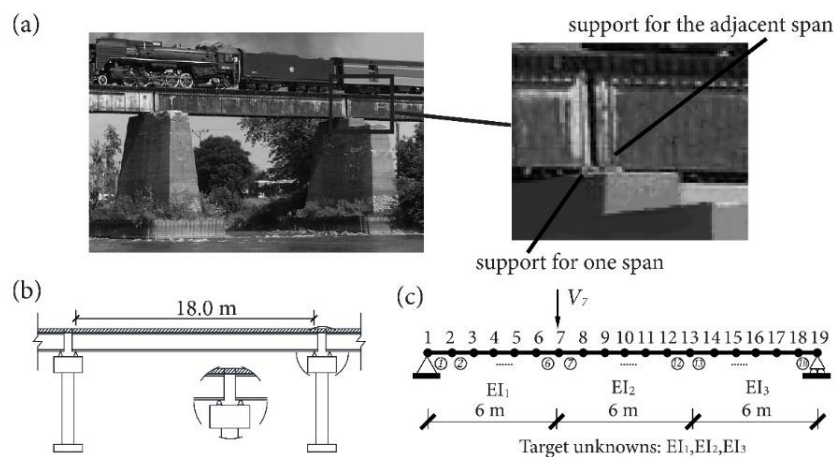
(a) Engineering practice of a multi-span simply supported beam; (b) elevation of 18-m span of a simply supported bridge; (c) 19-node beam model for the structure in (b)
